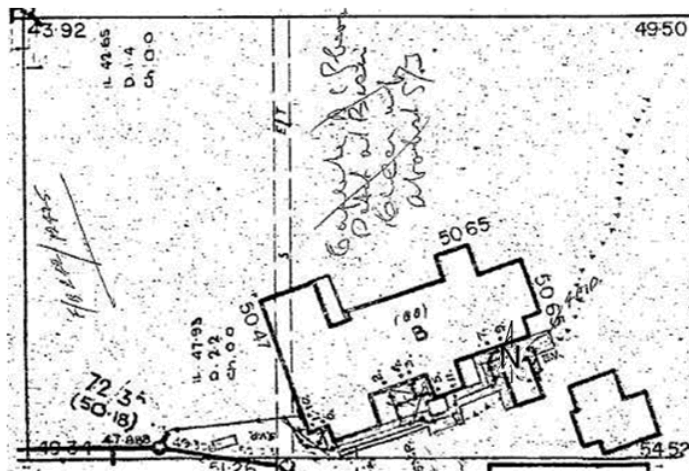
Footprints of buildings at the subject site, on a site plan that appears to date to 1974 (PSP).
